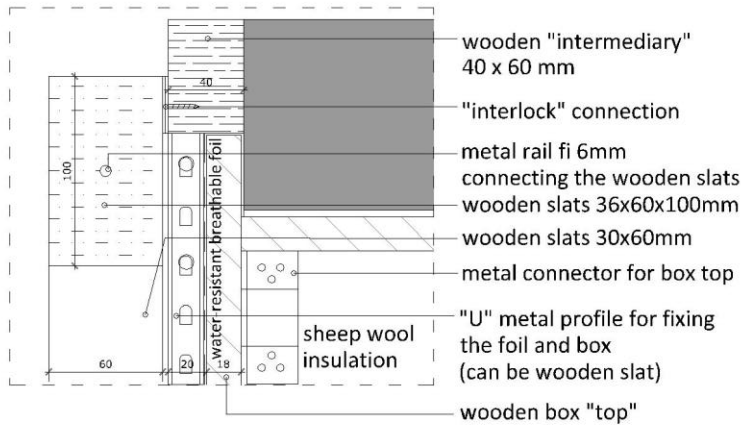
GDC wall system – views and sections of wooden frame. (source: 4D architects)
